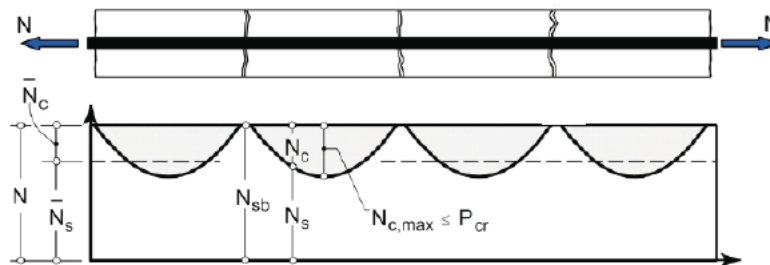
Load distribution along the length of a cracked reinforced concrete member (modified from Bischoff, 2001: 365).
